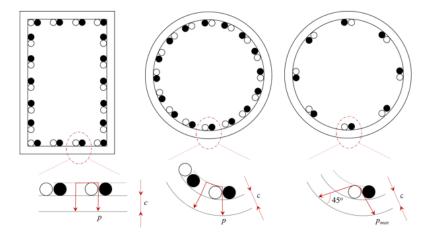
Perimeter of concrete block during lap-splice failure (Priestley et al., 1996): white and black circles represent the two lapped reinforcements.
